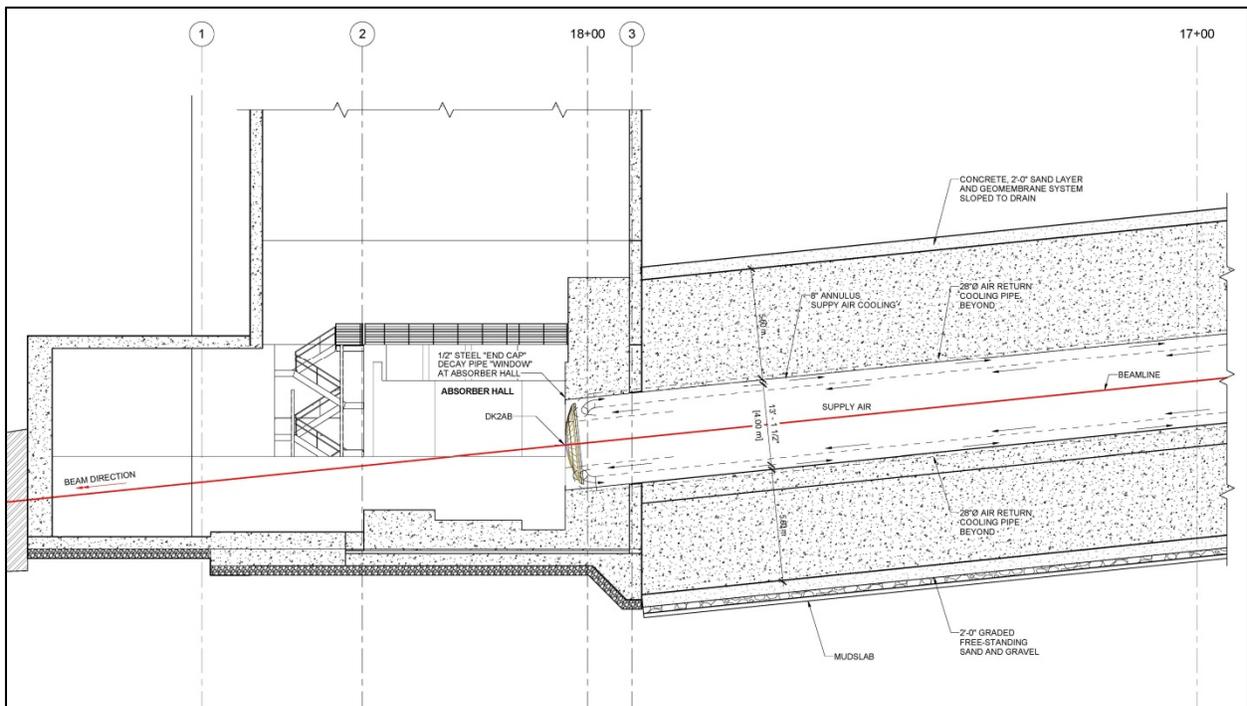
Longitudinal Section of the Decay Pipe at Absorber Hall
